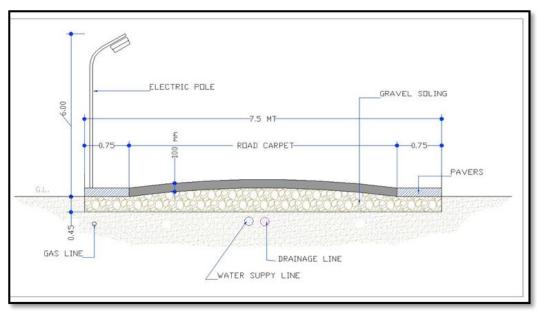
Typical Layout Plan for Road, Water Supply, Drainage
